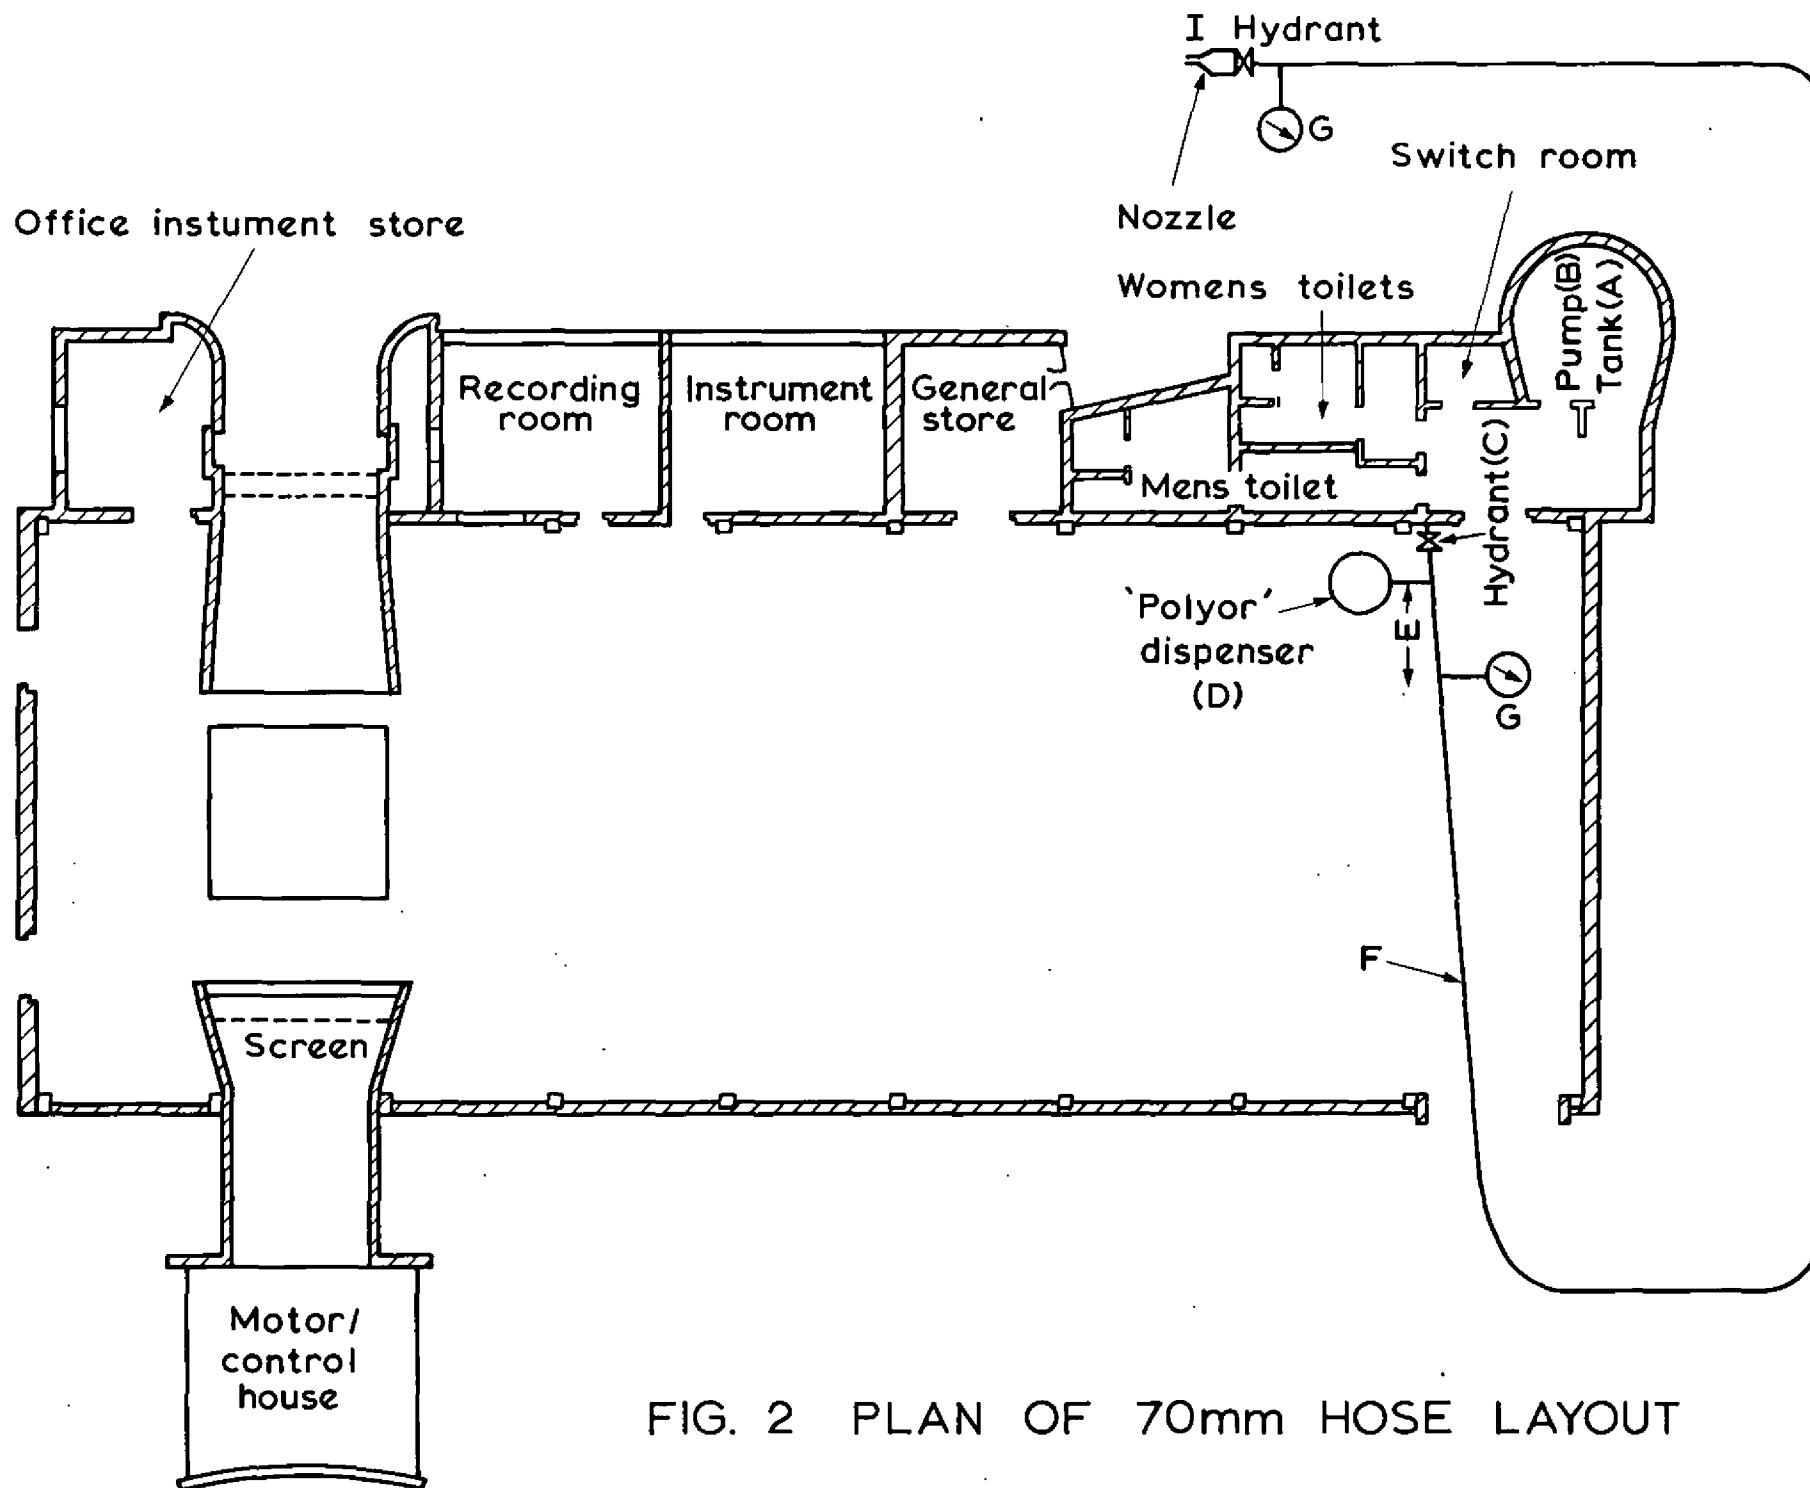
PLAN OF 70mm HOSE LAYOUT
